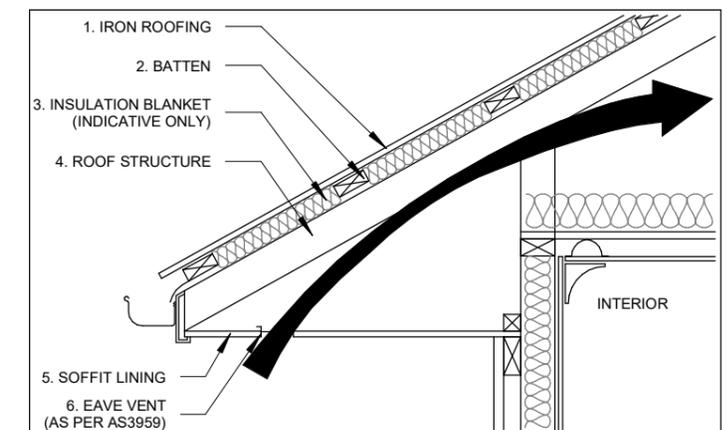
EAVES DETAILS : TRUSS & IRON ROOF BUSH FIRE MESH WHEN REQUIRED TO AS3959
